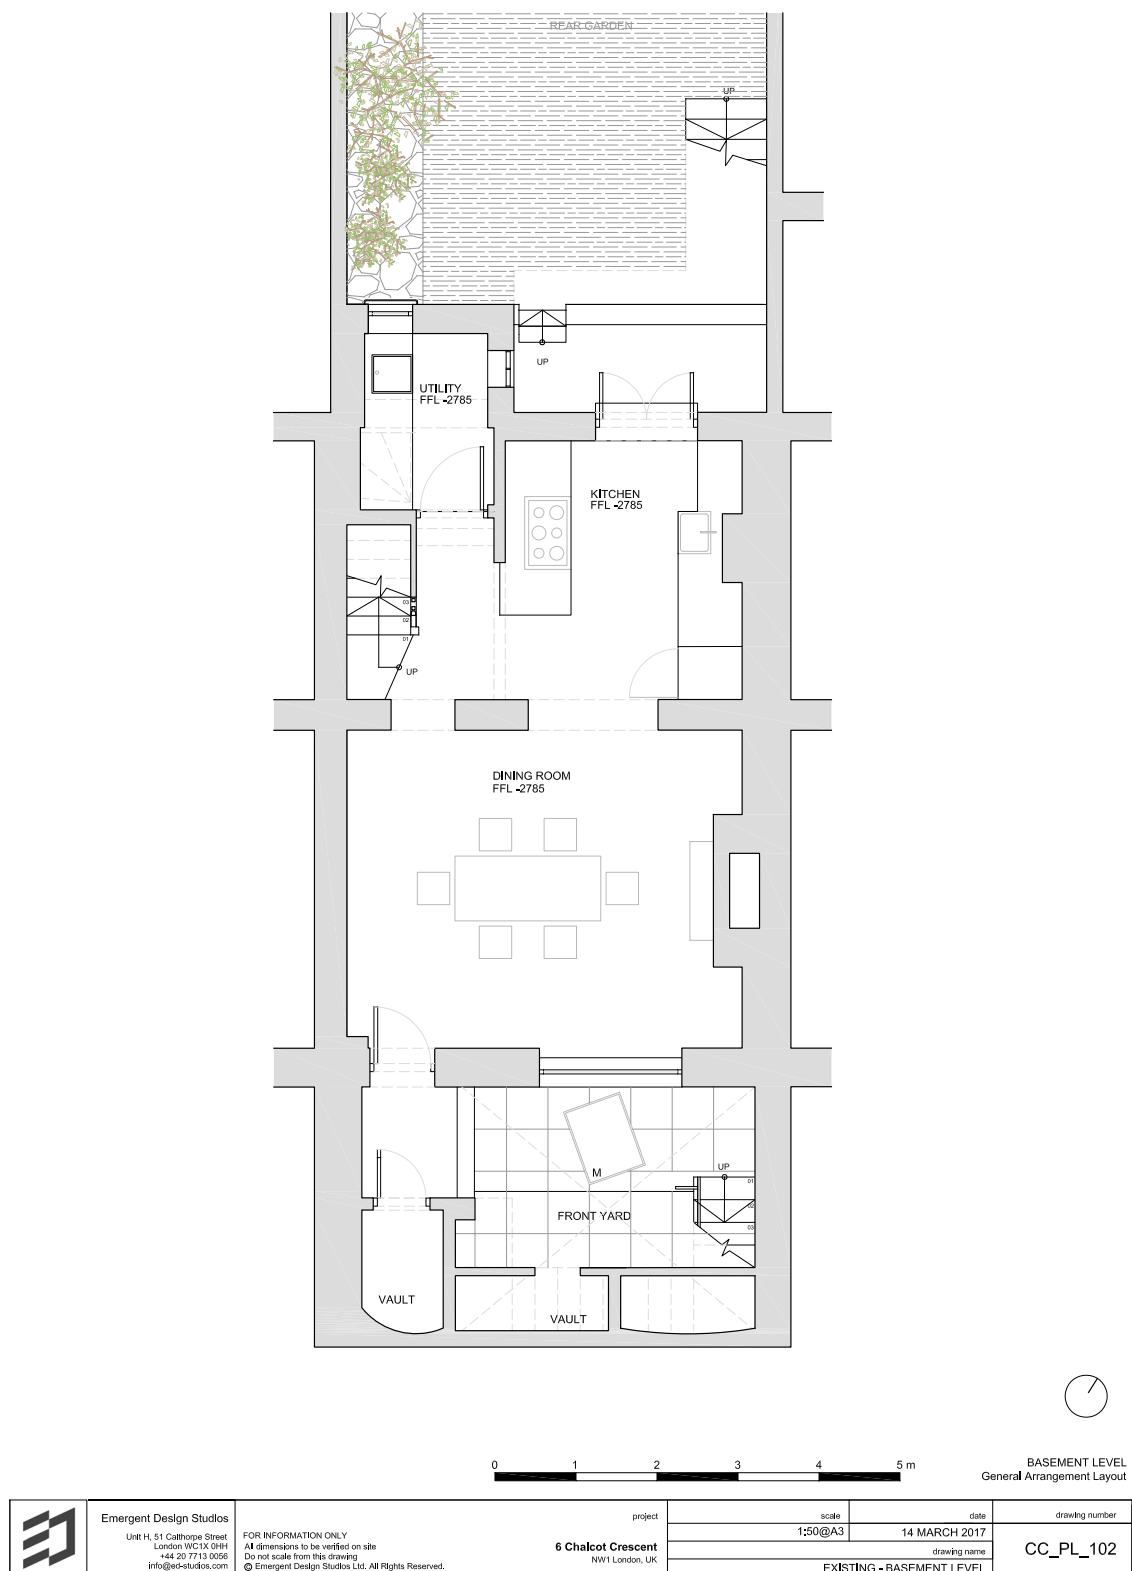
Basement plan in 2017 (Emergent Design Studios)
